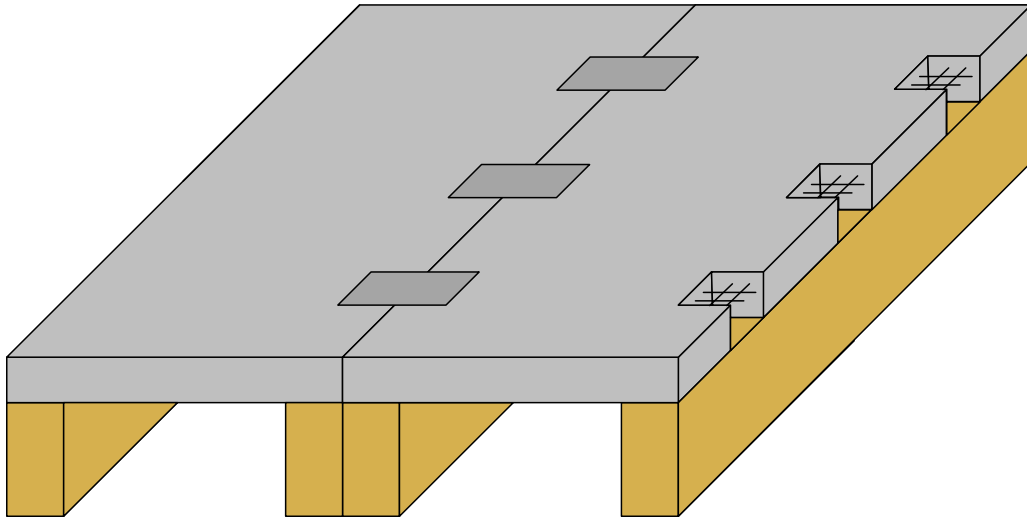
Illustration of an example of the connection between adjacent floor elements by recess notches connected by reinforcement and grouted on site.
